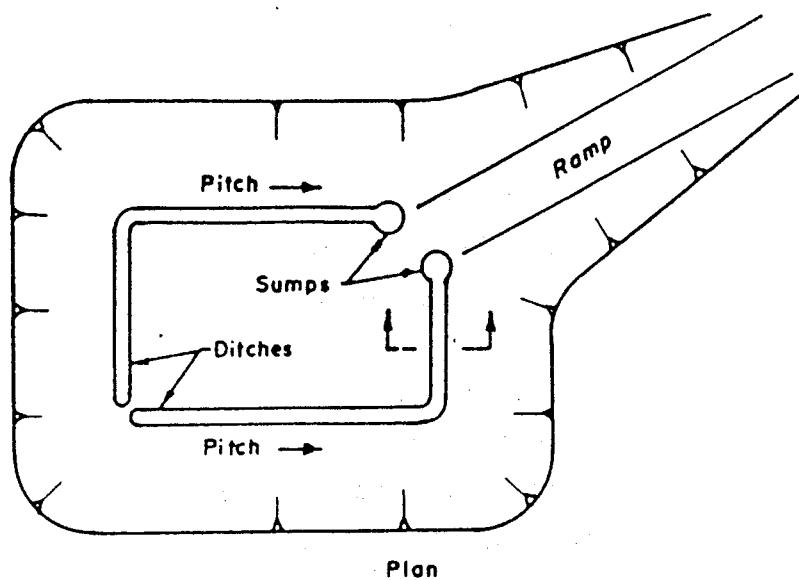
Layout Plan of Sump and Dewatering Trenches.
